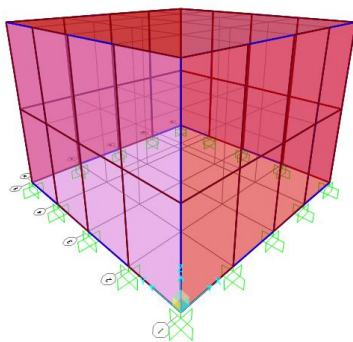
Single storey cross framed Dhajji-Dewari house prepared in SAP-2000.
